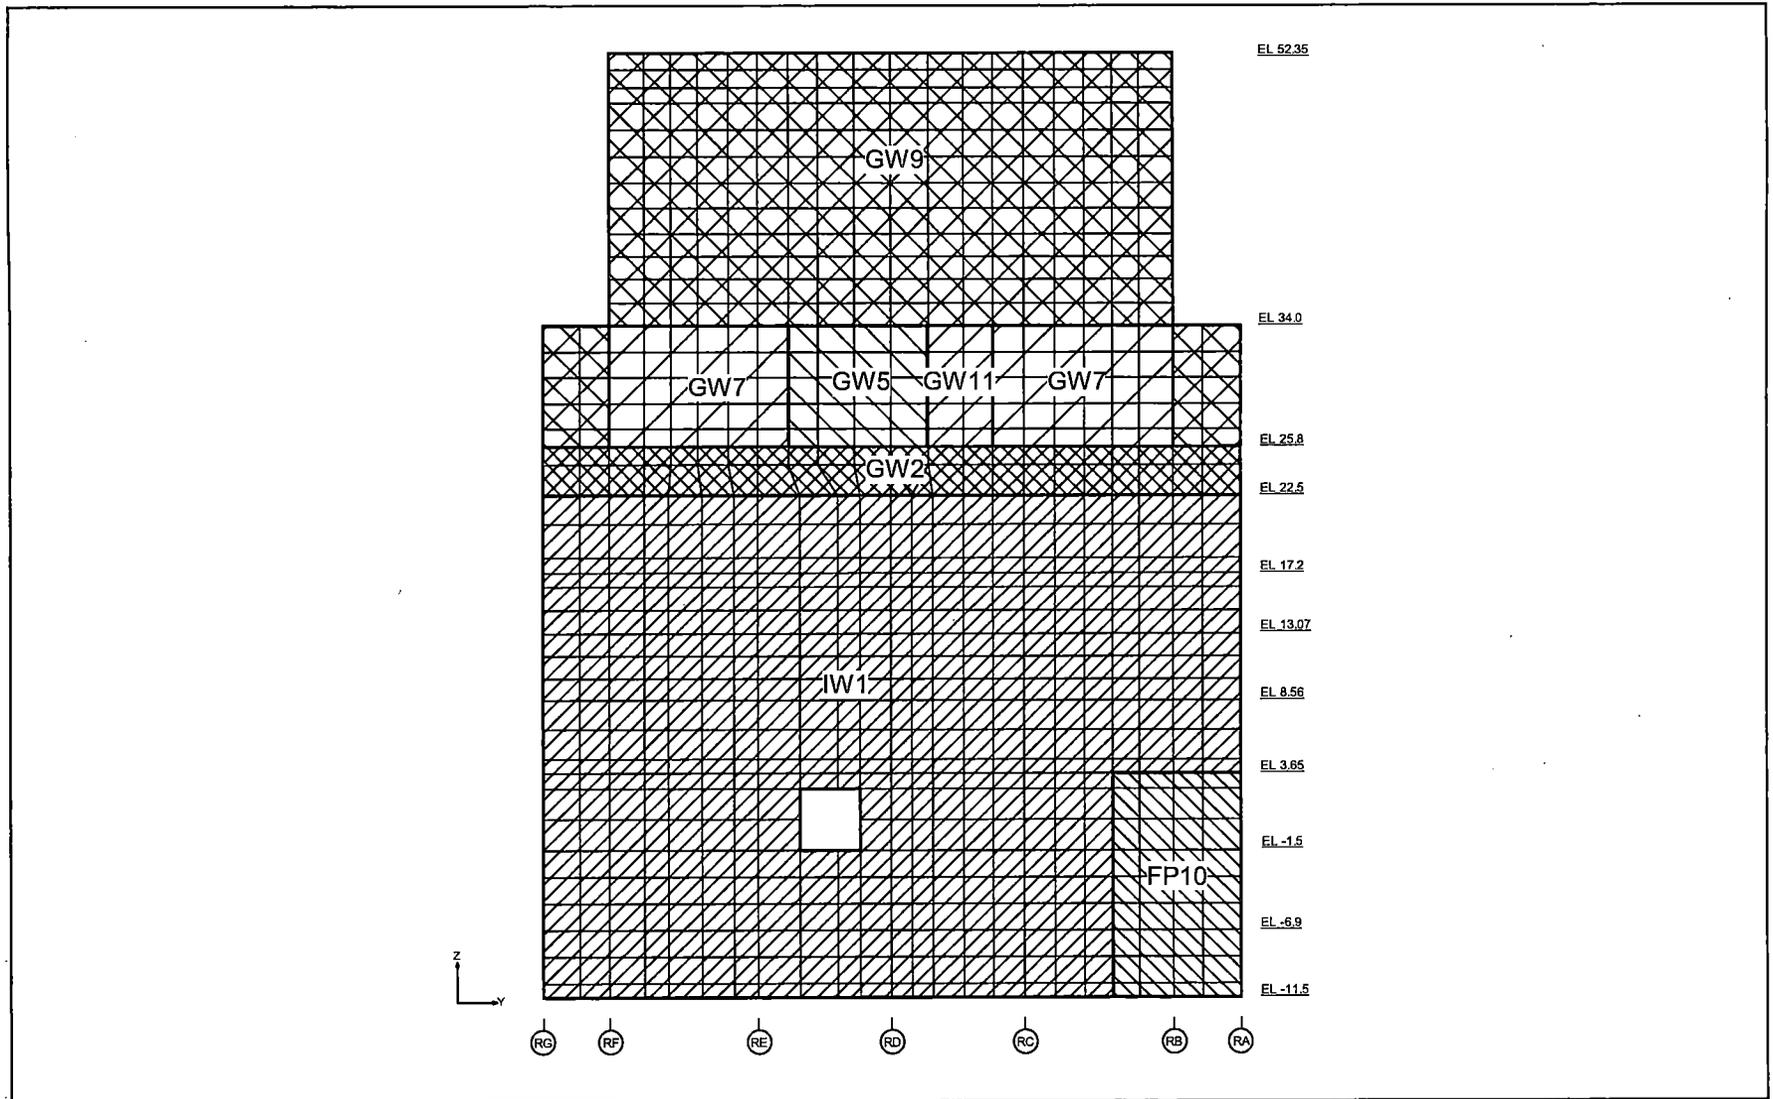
Application of Thermal Load on the External Wall (R7/F1)
